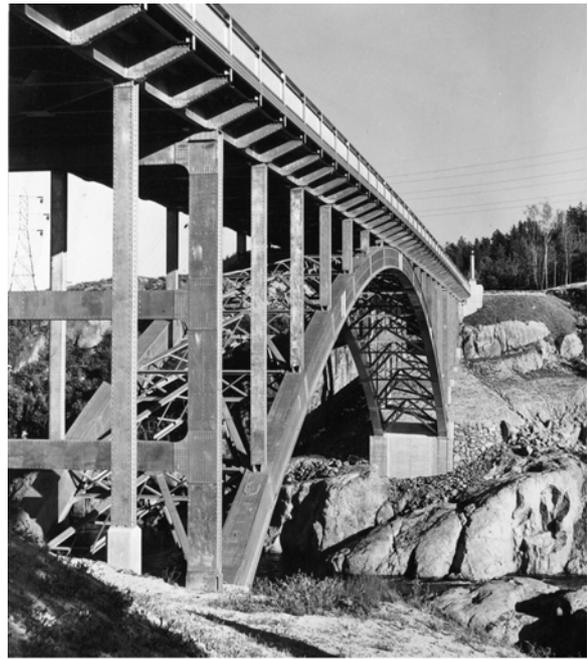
The Arvida Bridge, Quebec. All-aluminum arch, span = 91.5m. 1950. (Dominion Bridge)
